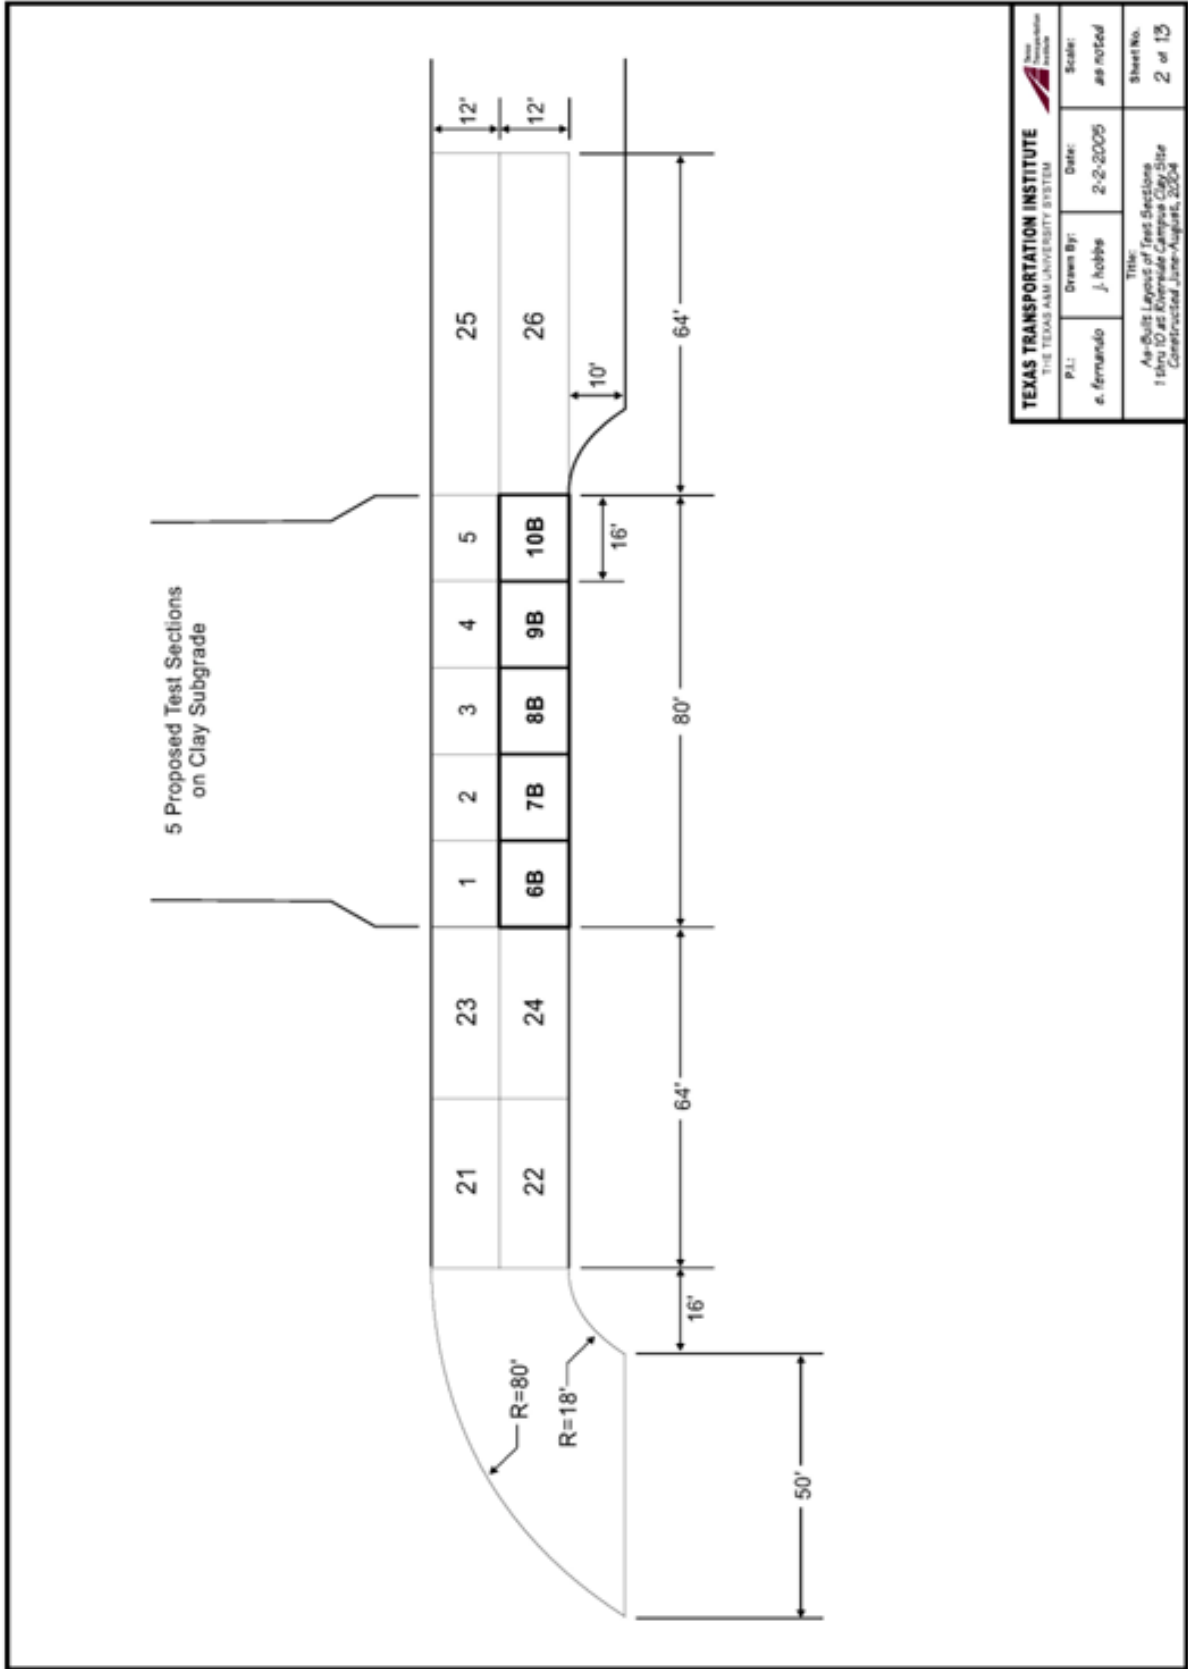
Layout of Stabilized Sections on Clay Subgrade.
